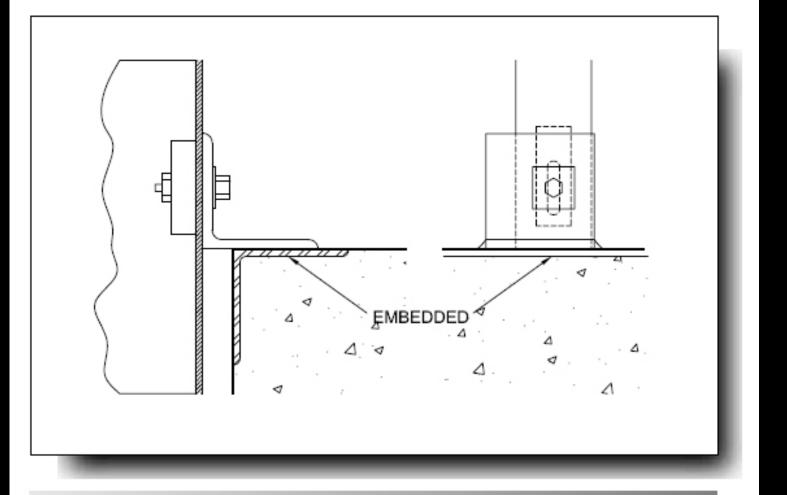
Common anchor in many stick-erected curtain wall systems
